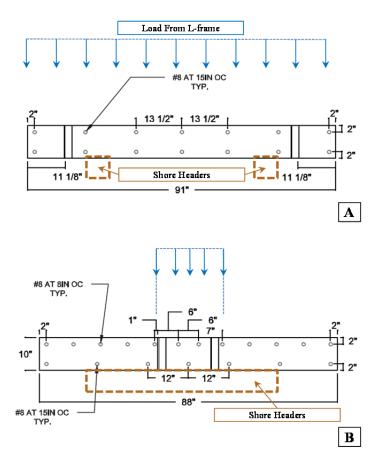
Concrete Slab Detail A) Front View B) Side View
